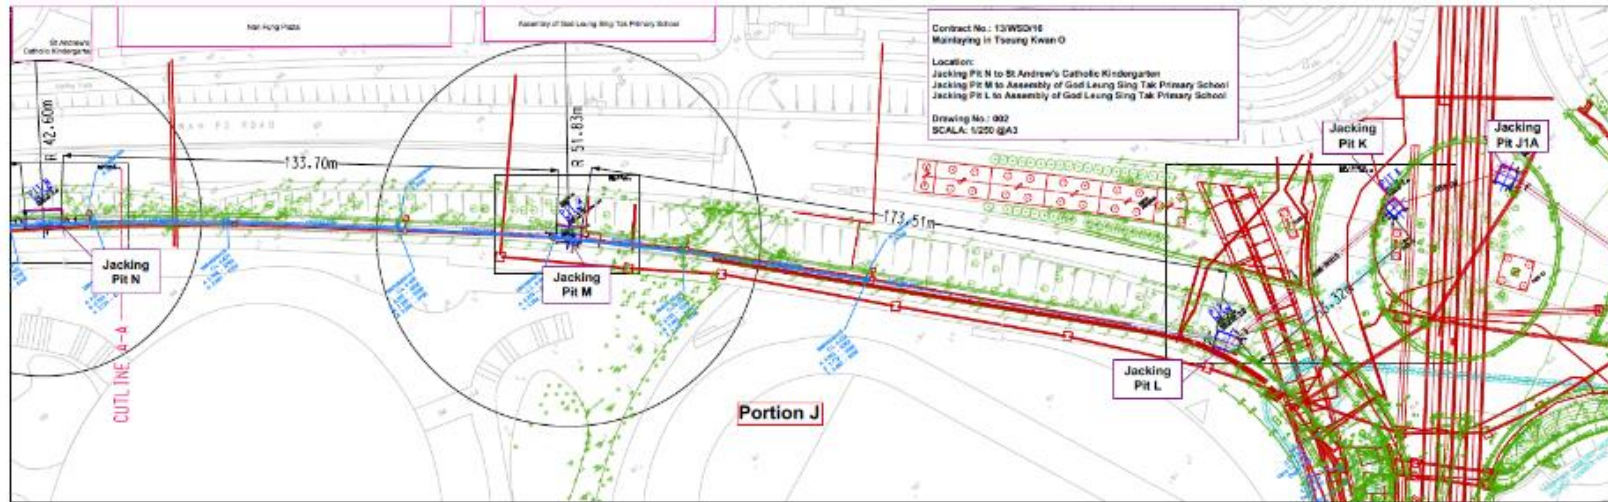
Location Plan for Portion J – Pit L-M-N, K, J1A
